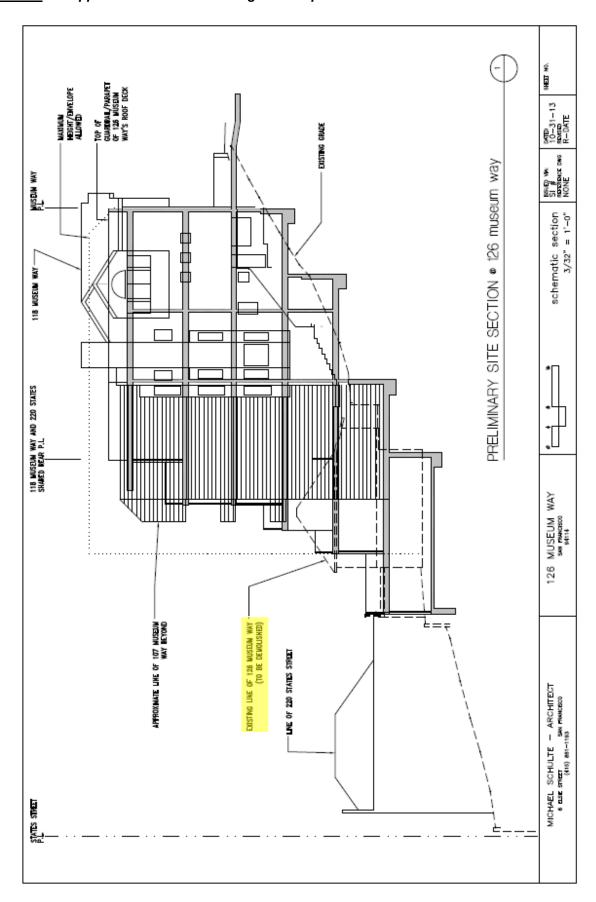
## Exhibit I: DR Applicant to Demolish Cottage and Replace with over 4500sf Structure
